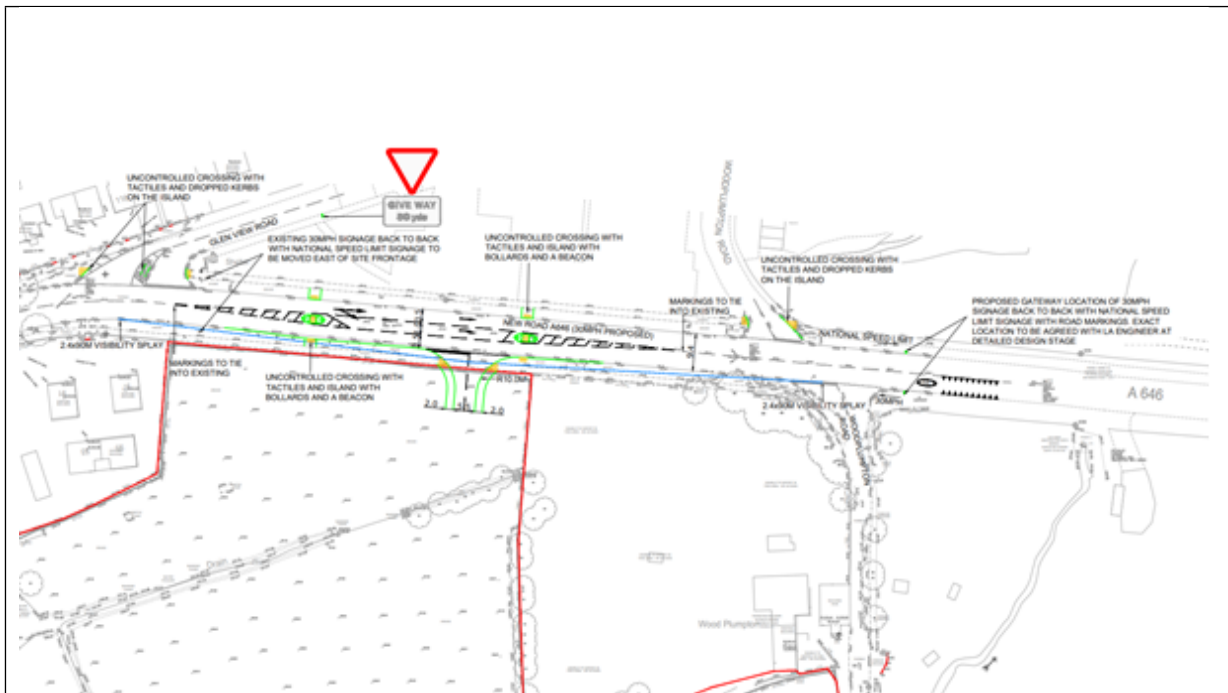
Proposed Access Plan which will be secured as part of a S278 Agreement with Lancashire County Council as Highway Authority
